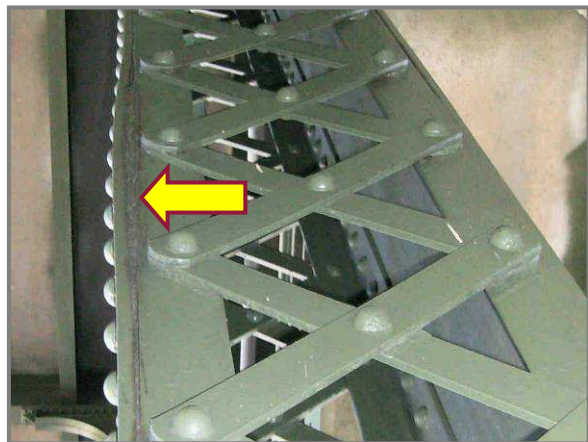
Impacted rust between the web plate and flange angle of member BL76-BU76 up to 7/8" thick.
